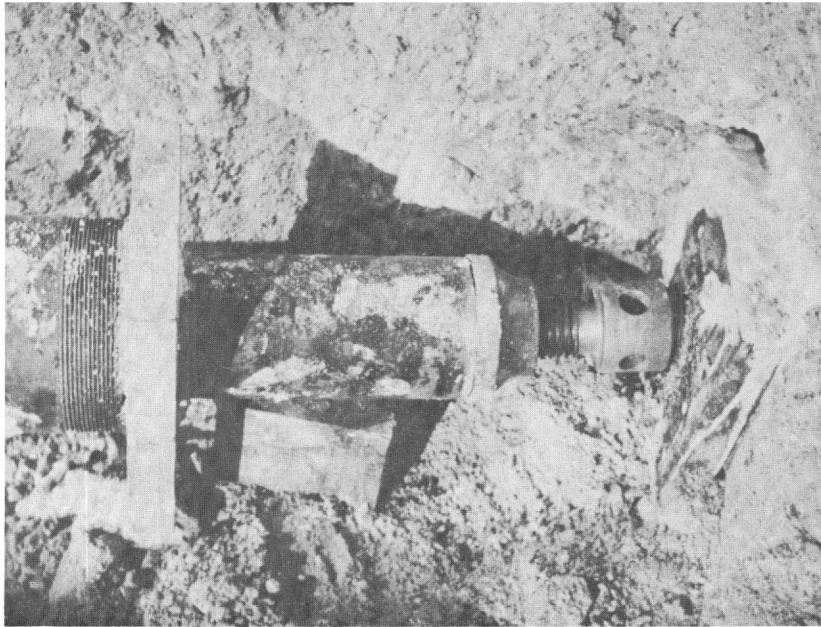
A ADJUSTABLE SCREW ASSEMBLY
